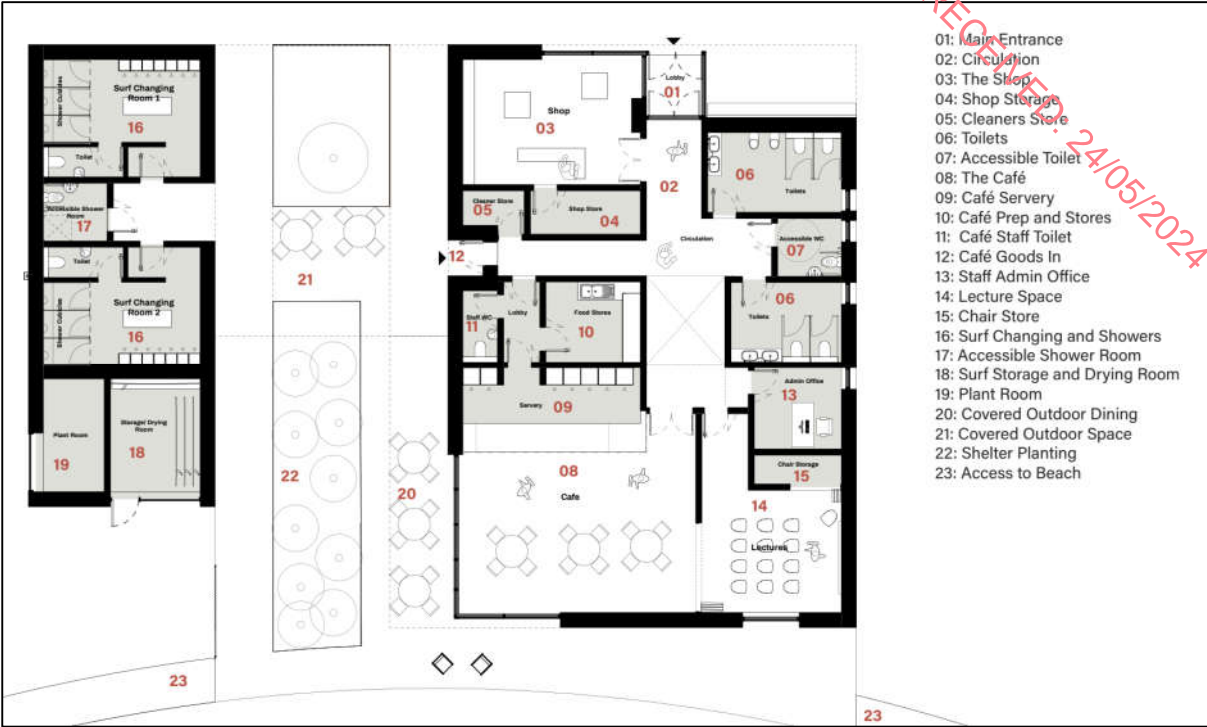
Preliminary Design of large beach surf school and café. (Floor area of 283.3m²)
